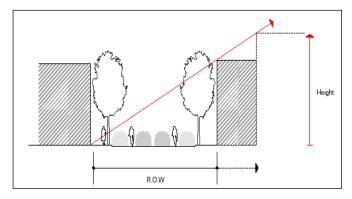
On wider streets, taller buildings may be required to provide appropriate street enclosure.
